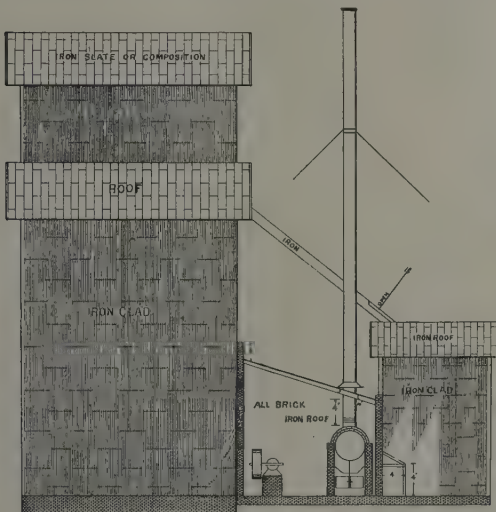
The improvements over the elevator shown in the preceding sketch are due to the use of brick, stone or cement in constructing the power house attached. The boiler setting should have at least a 4-inch hollow wall next to cob or fuel room and division walls between power house and elevator and cob room should extend 2 feet above the power house roof.
